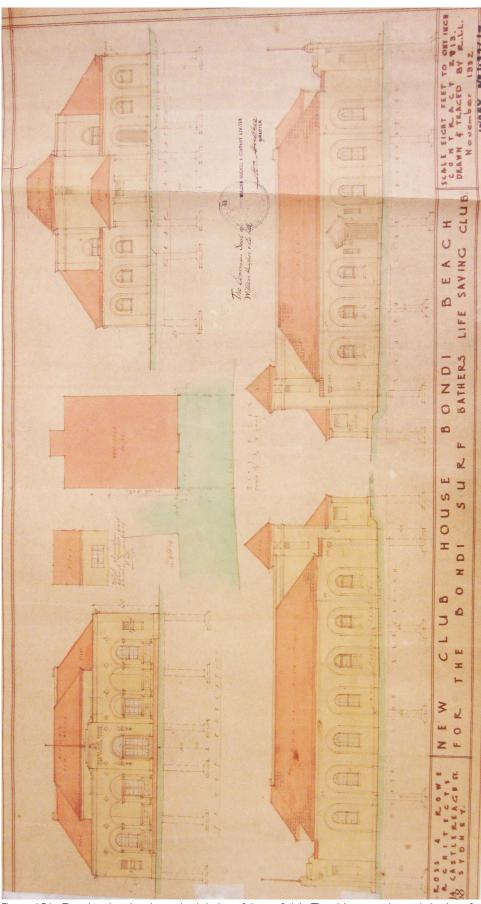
Drawing showing the revised design of the surf club. The side rooms have pitched roofs. The front elevation is similar but the walls of the sunbaking terrace are hidden by the added roofs. Semi-circular headed windows and recesses have been added to the side elevations. Note the rear stair tower and pitched roof. Source: Jean Rice Architect, photographed at WC LSC.
